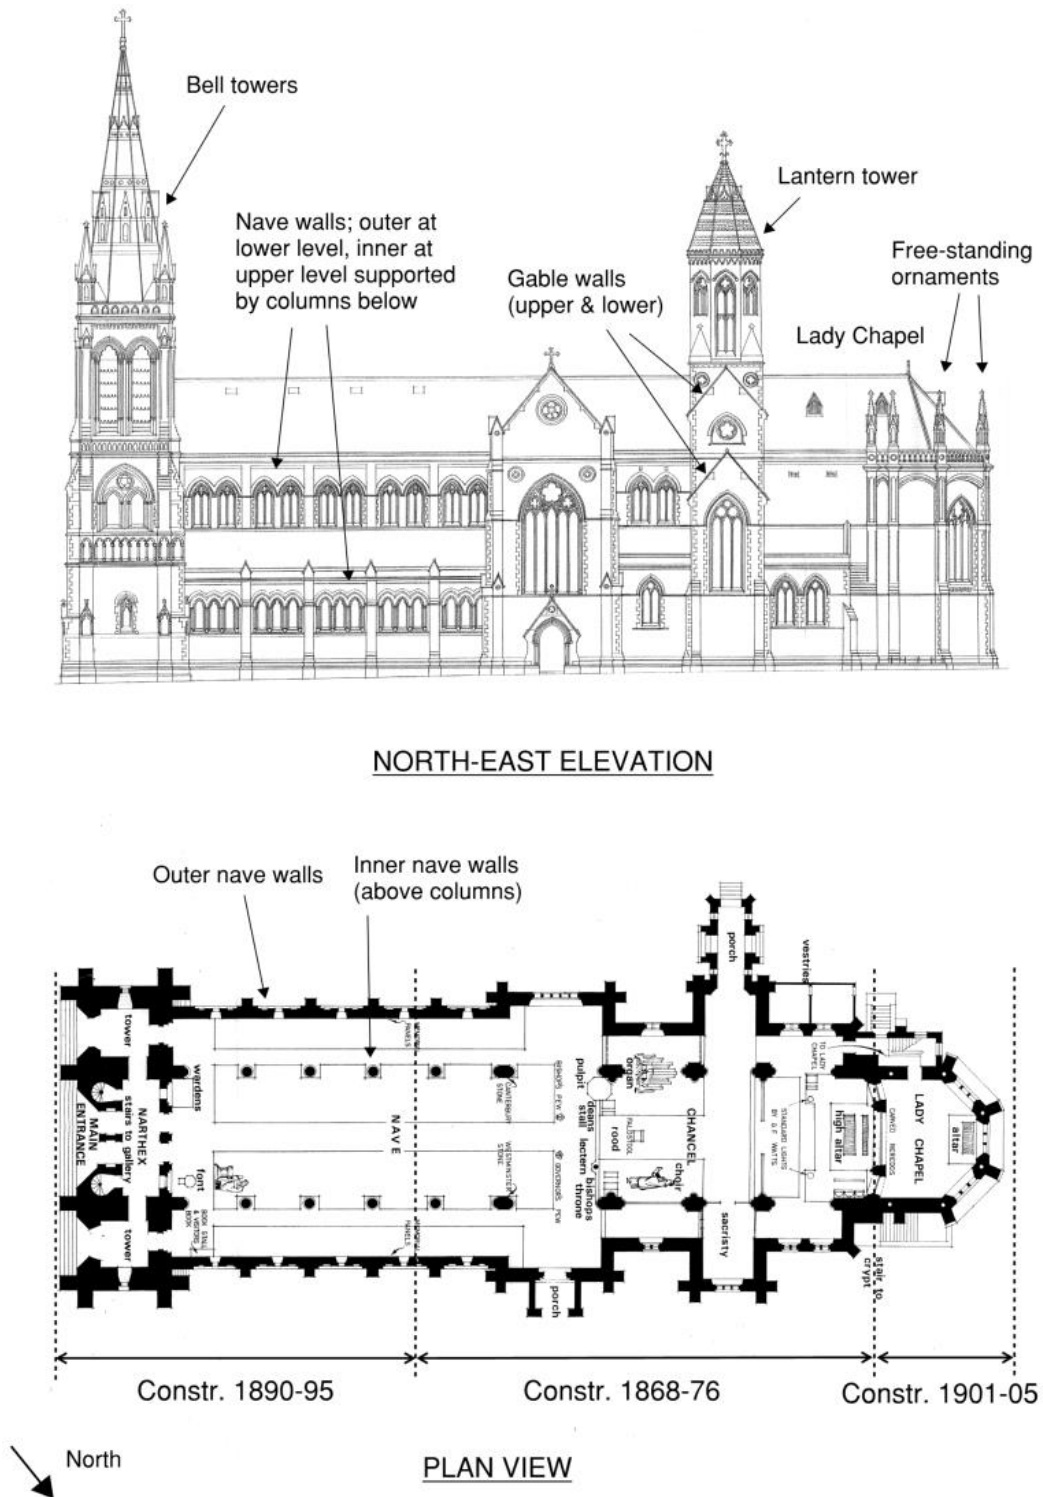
Plan and longitudinal elevation of St Peter's Cathedral
